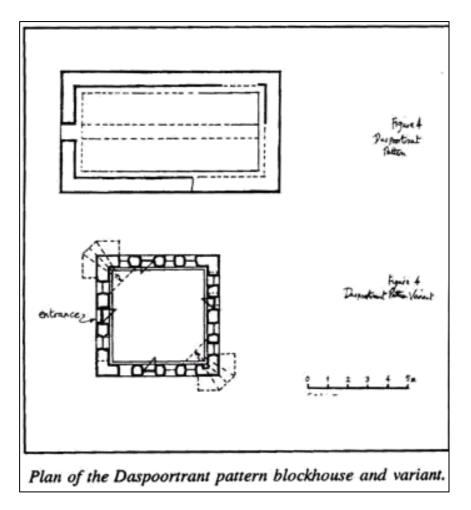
Plan of a Daspoortrand pattern blockhouse.
